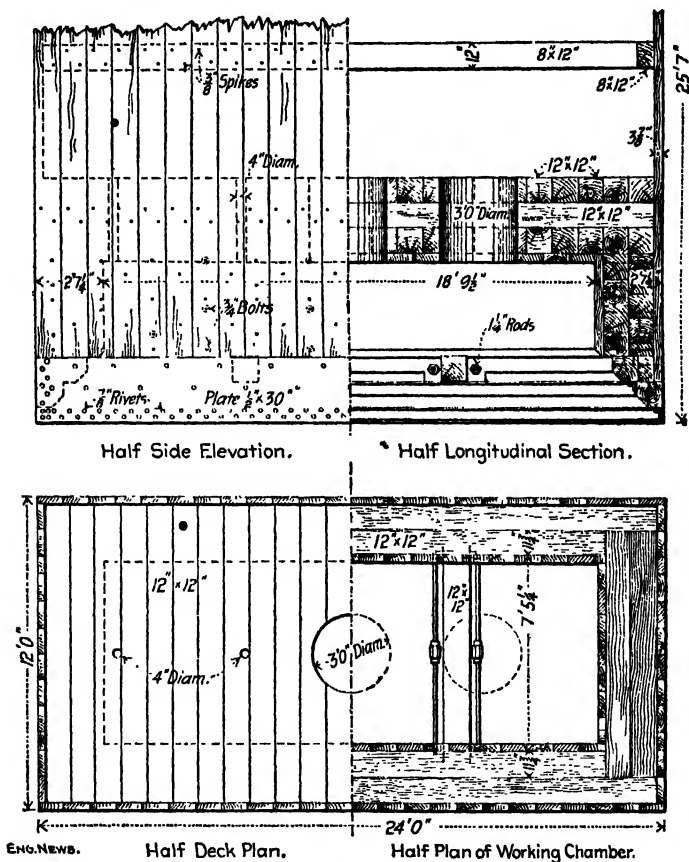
Pneumatic Caisson of Timber Construction.
